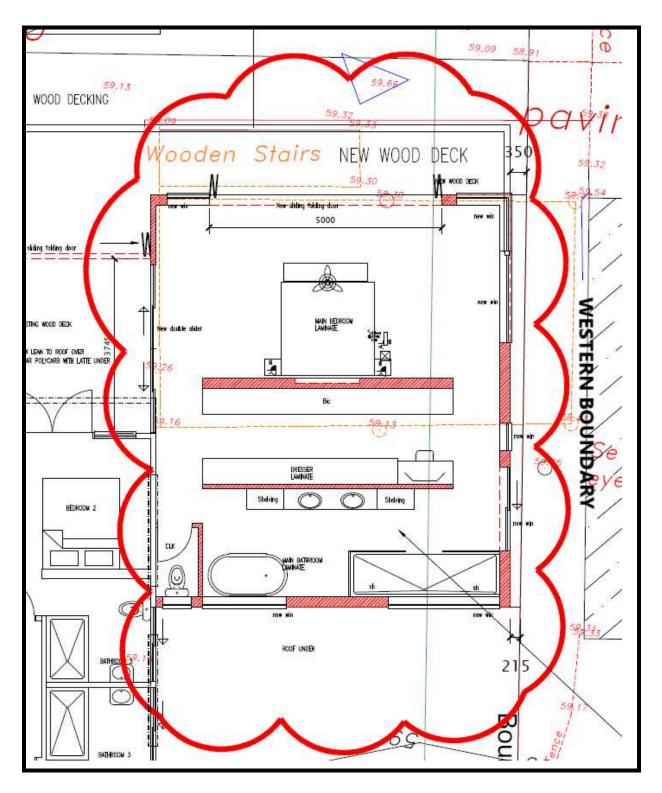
PROPOSED FIRST FLOOR EXTENSION
